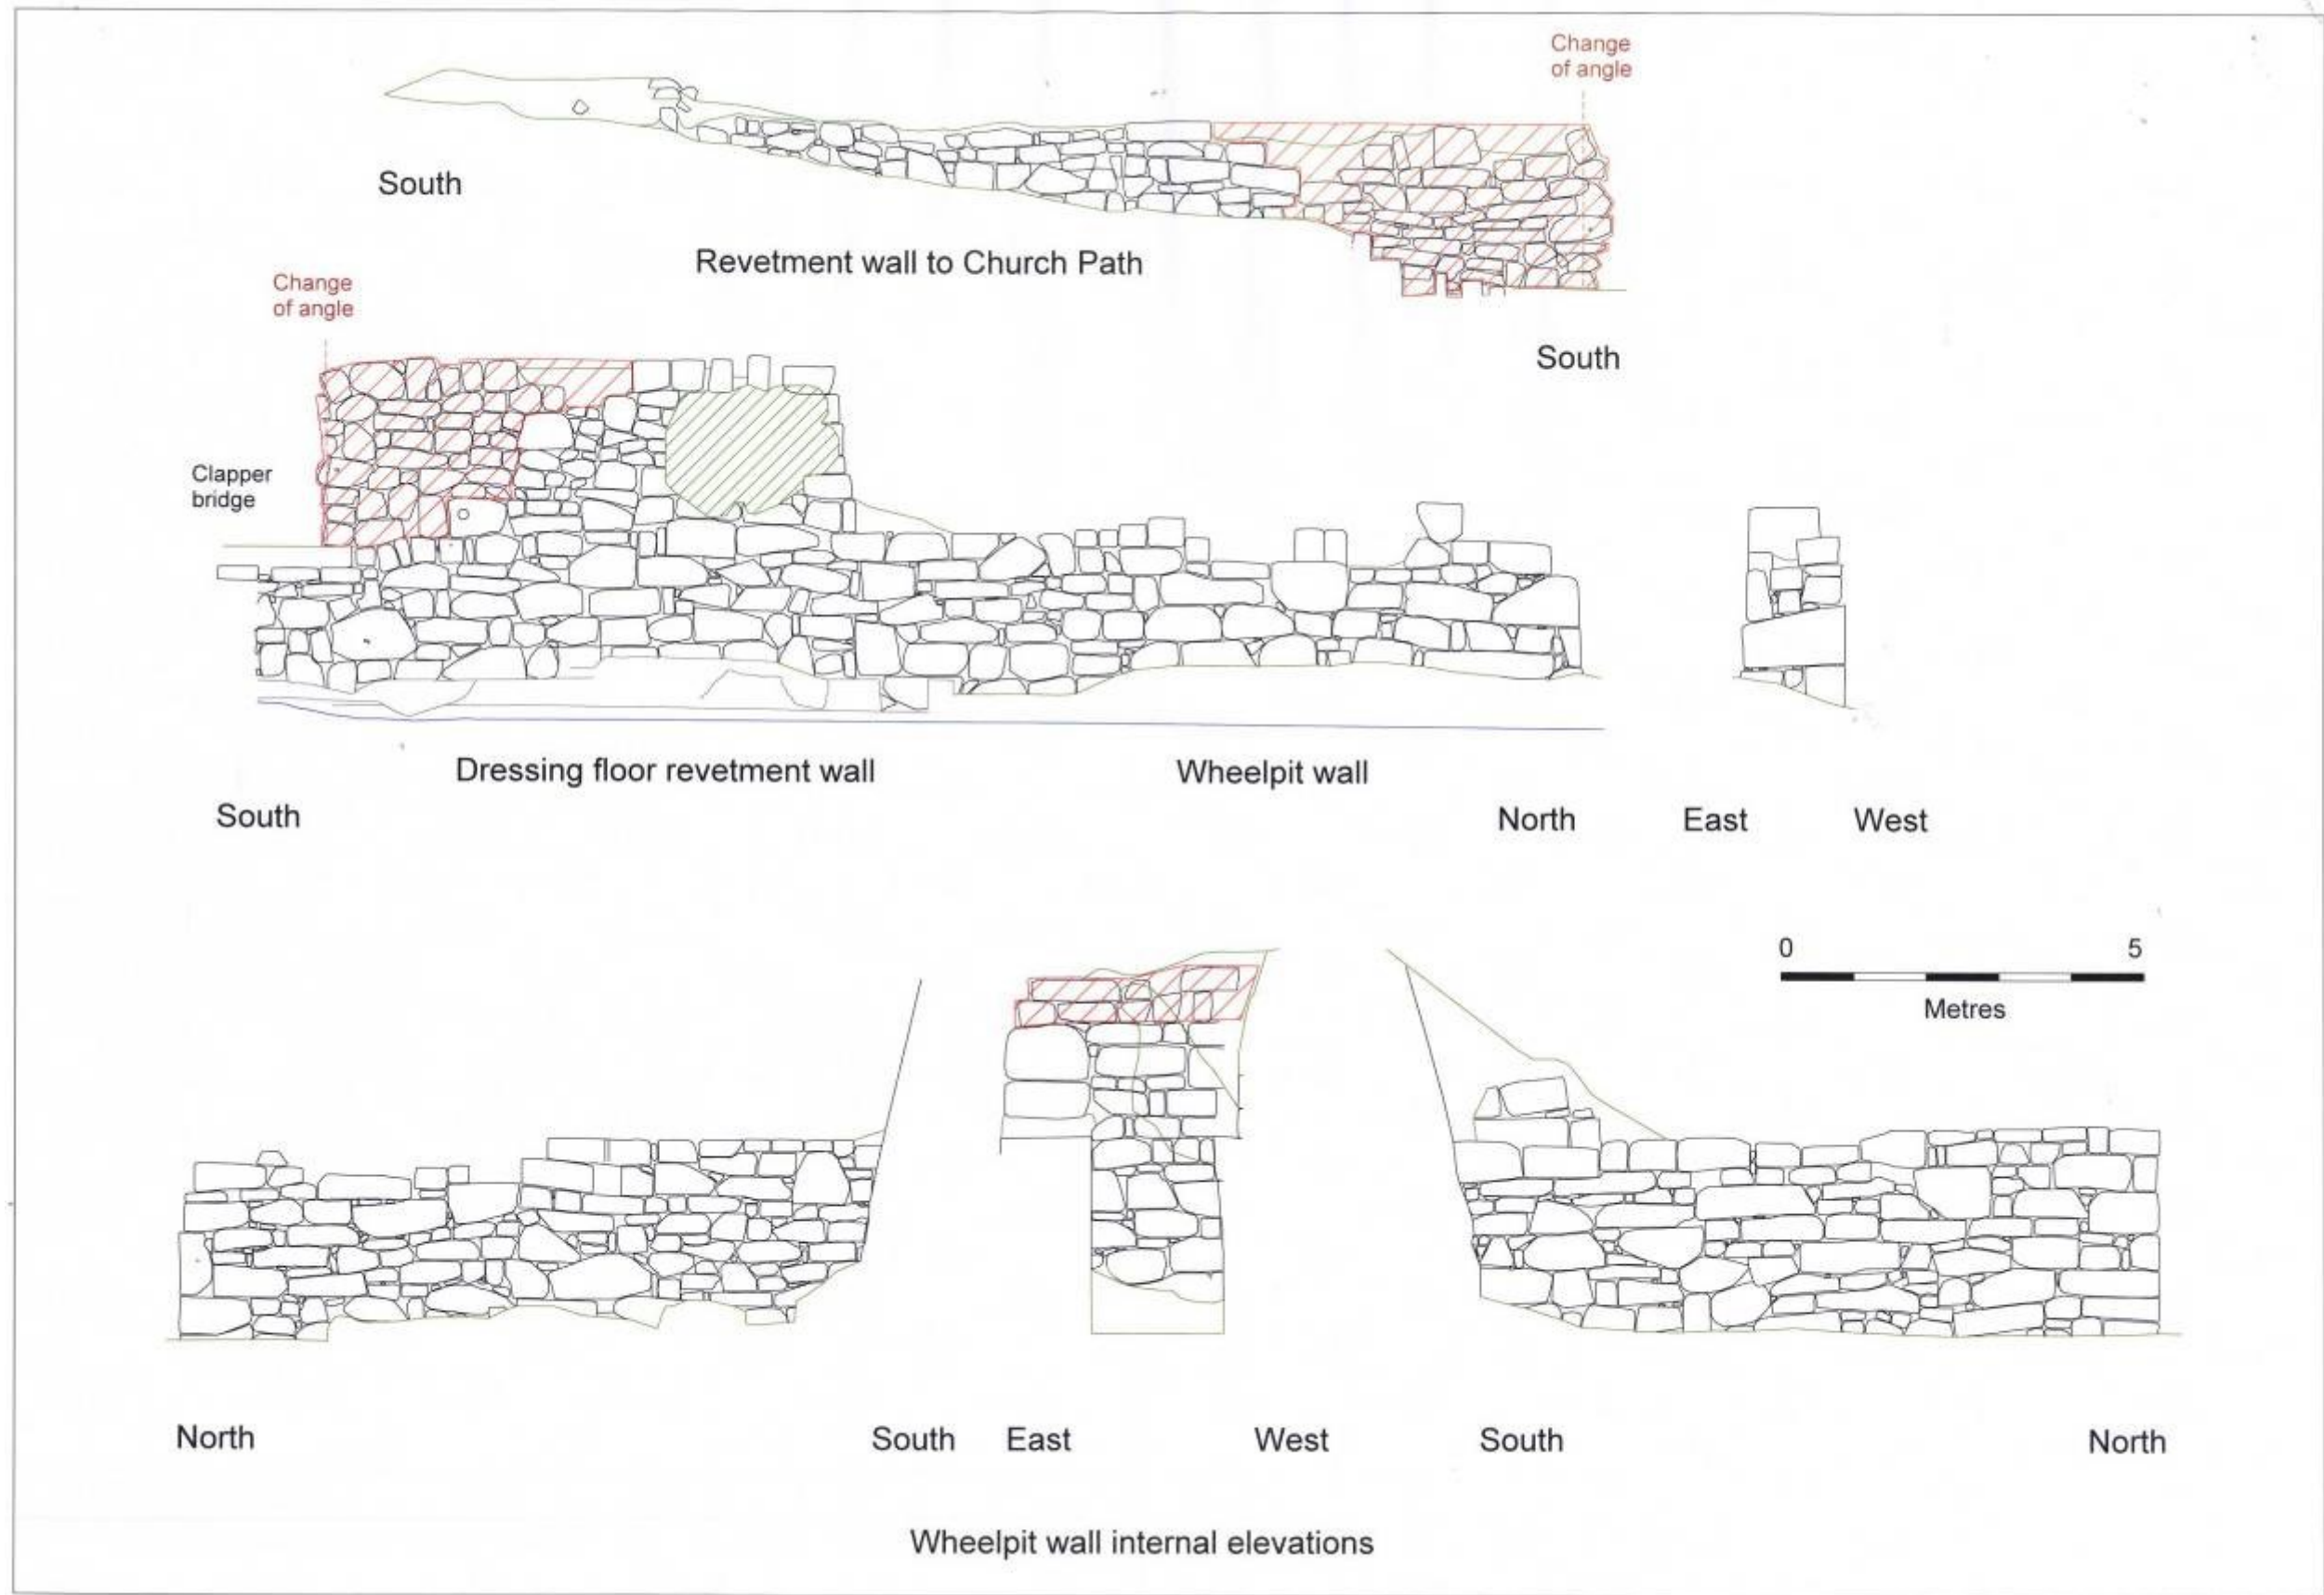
The 2012 survey of the Porthmeor spalling floor and wheelpit elevations. Red hatching indicates areas likely to require rebuilding, green hatching indicates areas where recording was difficult or impossible due to residual ivy cover. Grey indicates the mass concrete cast up against the base of the wall, whilst blue indicates stream level.
